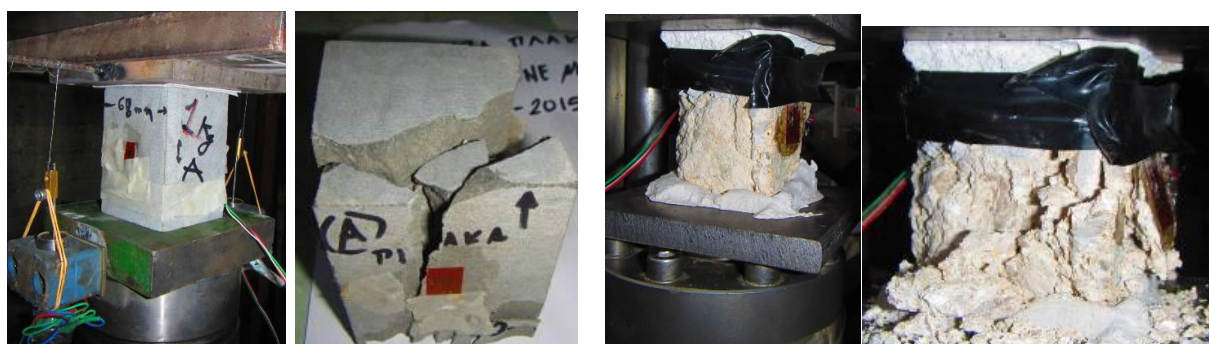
Testing in compression stone samples (left) and mortar samples (right) from Plaka Bridge
